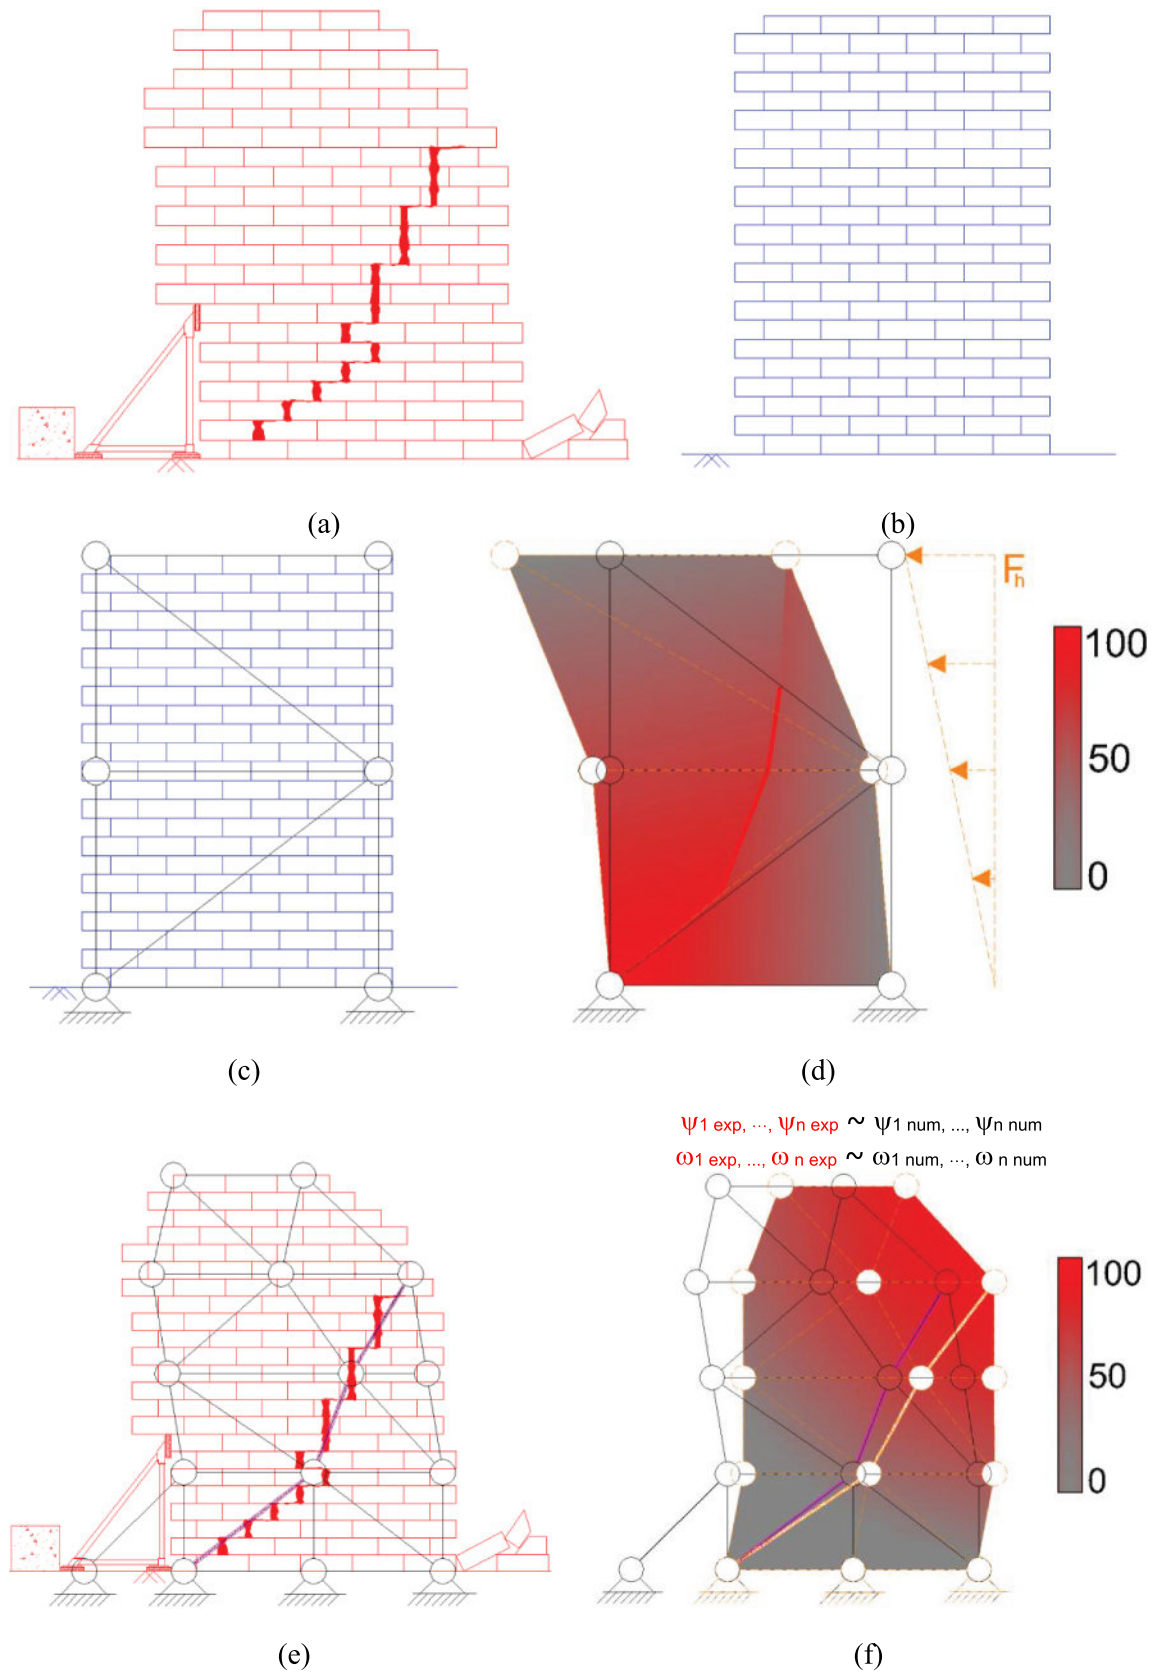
Illustrative examples of the structural state and modeling : (a) the current state of a masonry wall including cracks, deformations, loss of material, and propping intervention; (b) the original as-built configuration disregarding deformations, structural interventions, and damage; (c) structural model derived from the assumed undamaged configuration; (d) deformed configuration after numerical analysis, in orange; (e) structural model representing the current state, in purple the interface elements modelling cracking; and (f) numerical modal deformation ($\Psi_{n \text{ num}}$) in orange, during the model updating process. Valerio Sabbatini © 2020 J. Paul Getty Trust.
